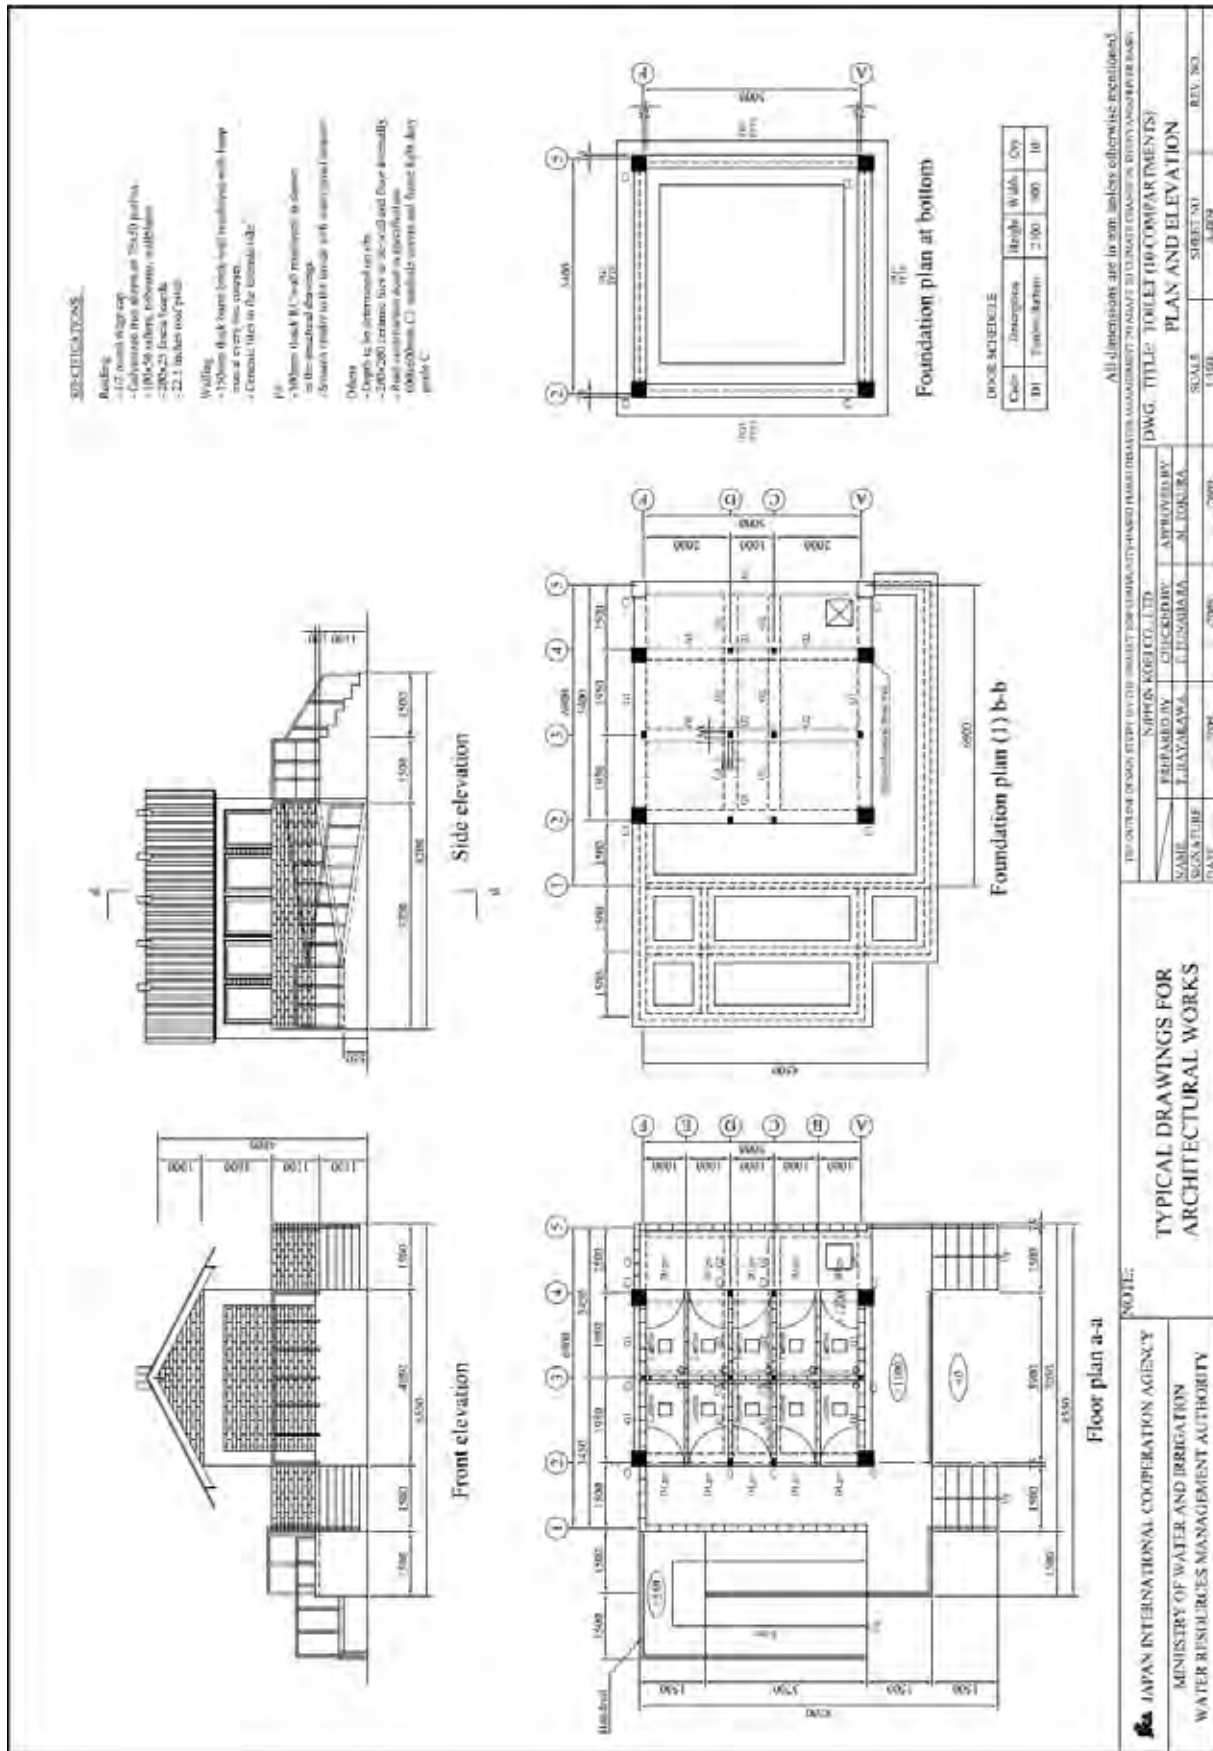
Toilet (10 compartments): Plan and Elevation
